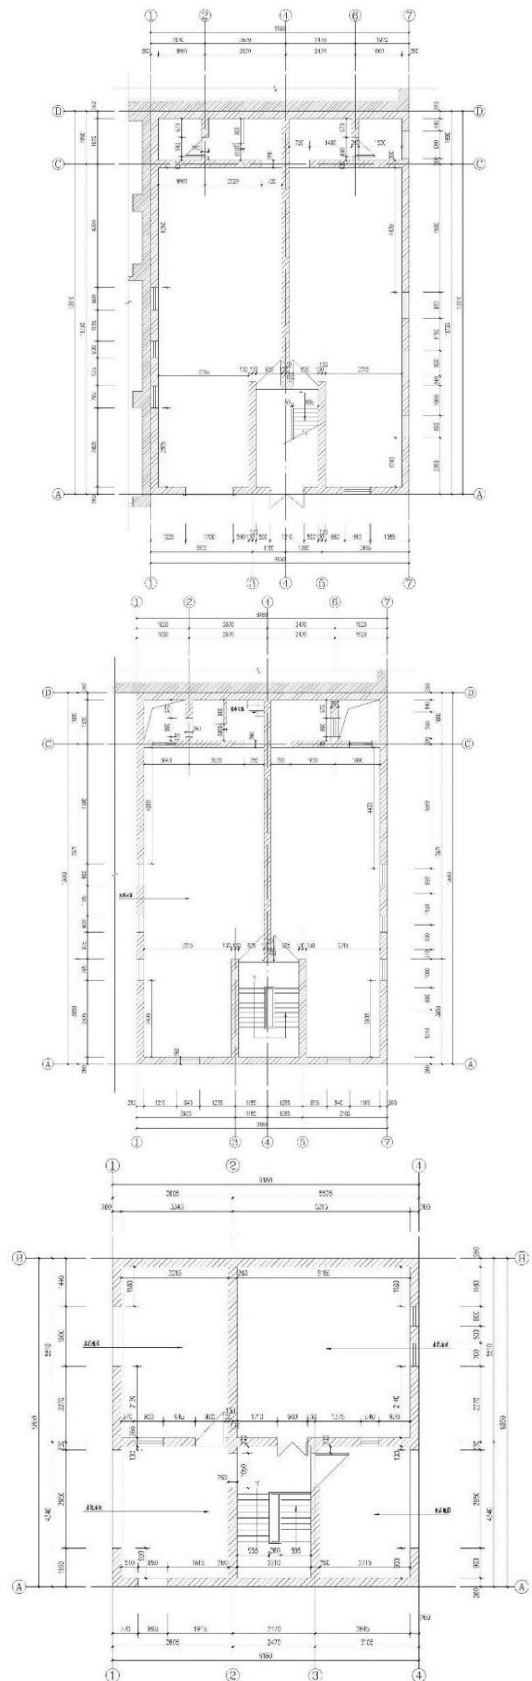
Floor plan survey drawing of No. 3-5 Yongqing Street (Source: Guangzhou Vanke Yongqingfang Project Department)
